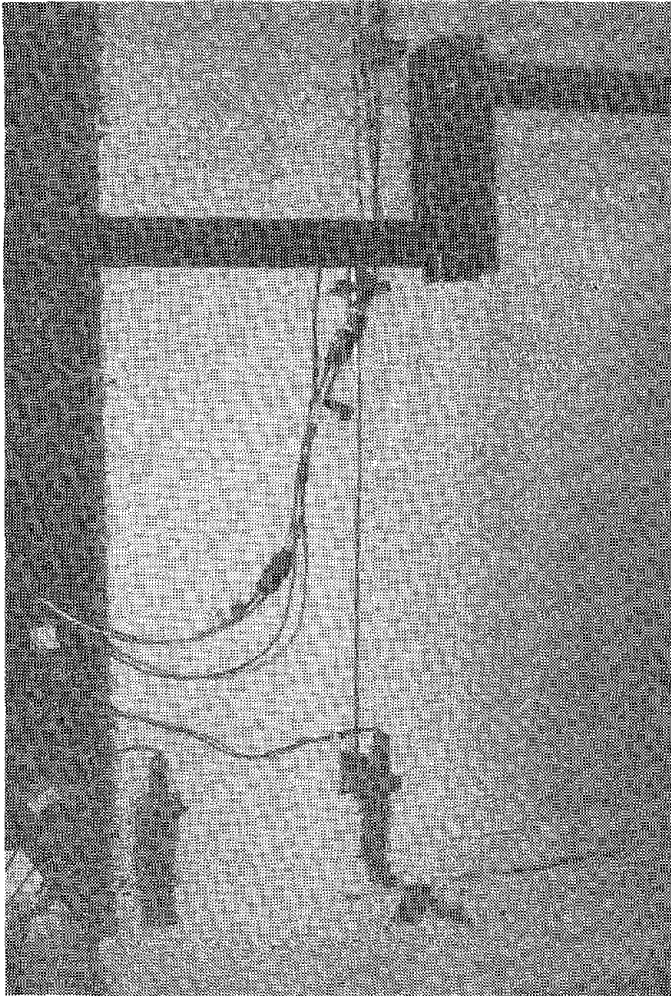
DCDT's mounted on flange wall to measure extension and uplift across floor joint.
